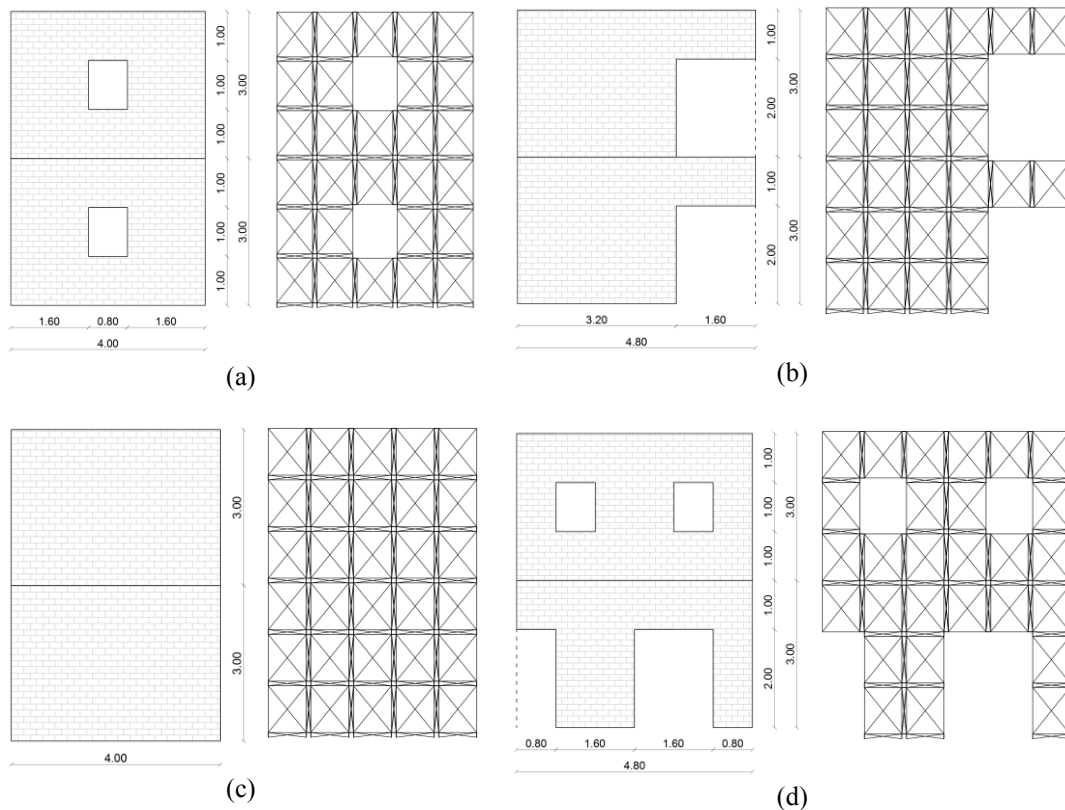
Façades and model of the building. (a) Wall 1; (b) Wall 2; (c) Wall 3; (d) Wall 4.
